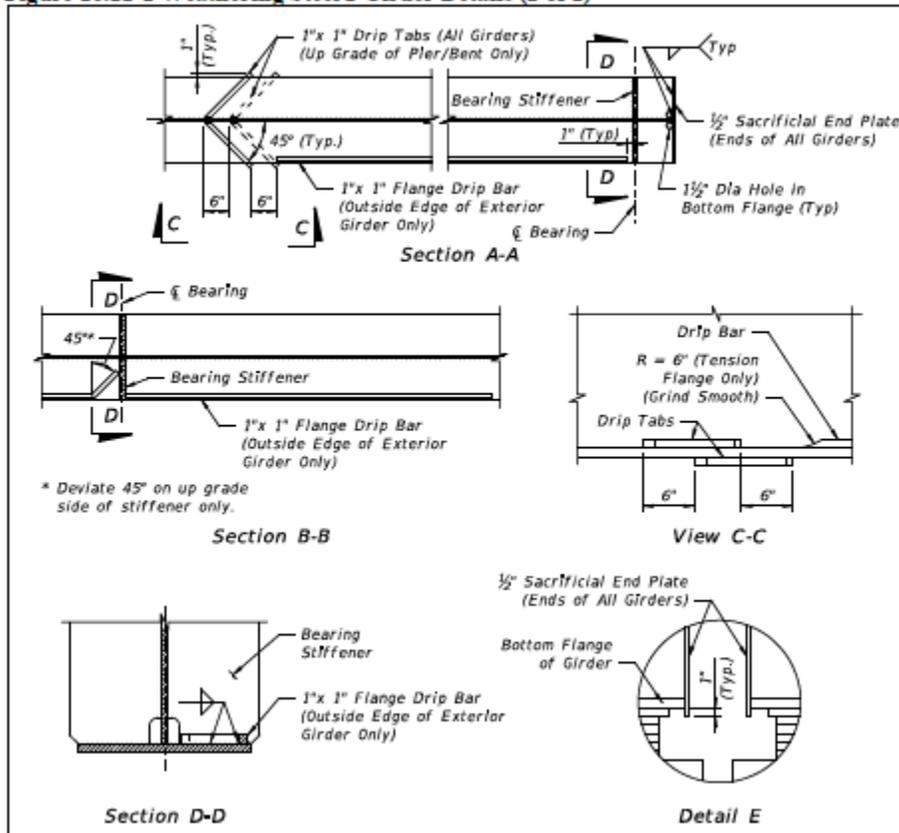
Weathering Steel I-Girder Details (1 of 2)
